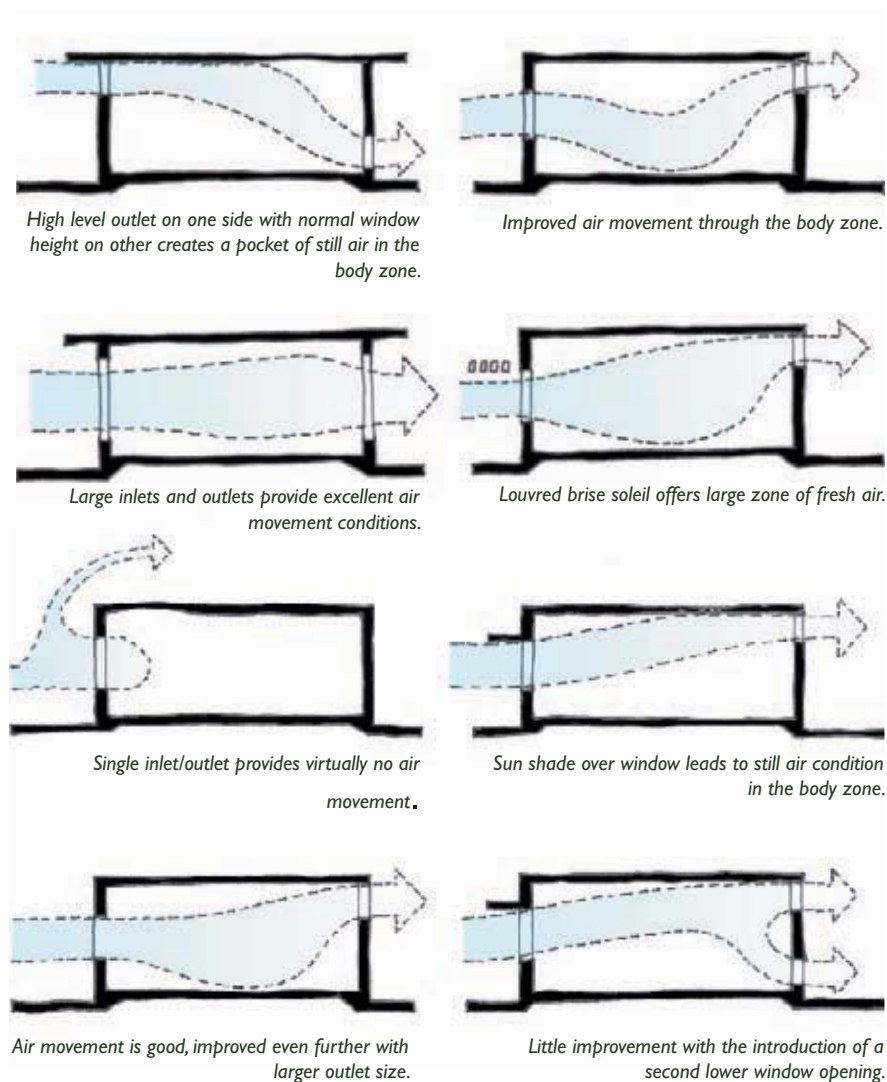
Building sections showing arrangements of openings to encourage natural ventilation
